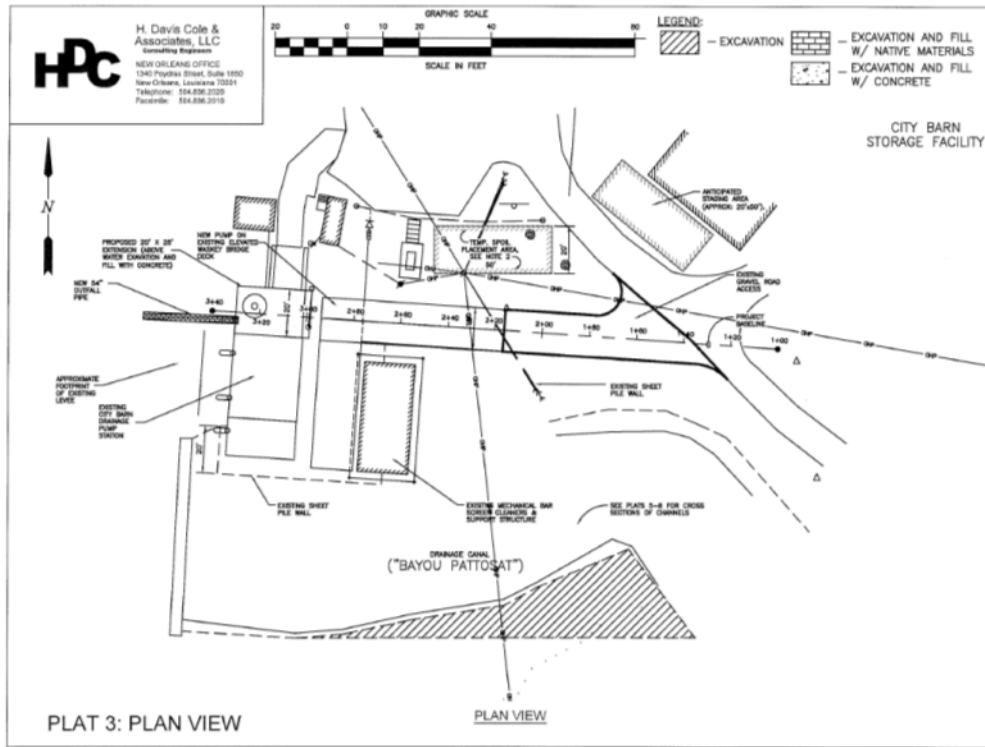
H. Davis Cole & Associates Consulting Engineers plan view for the City Barn Drainage Improvements Project in Slidell.
